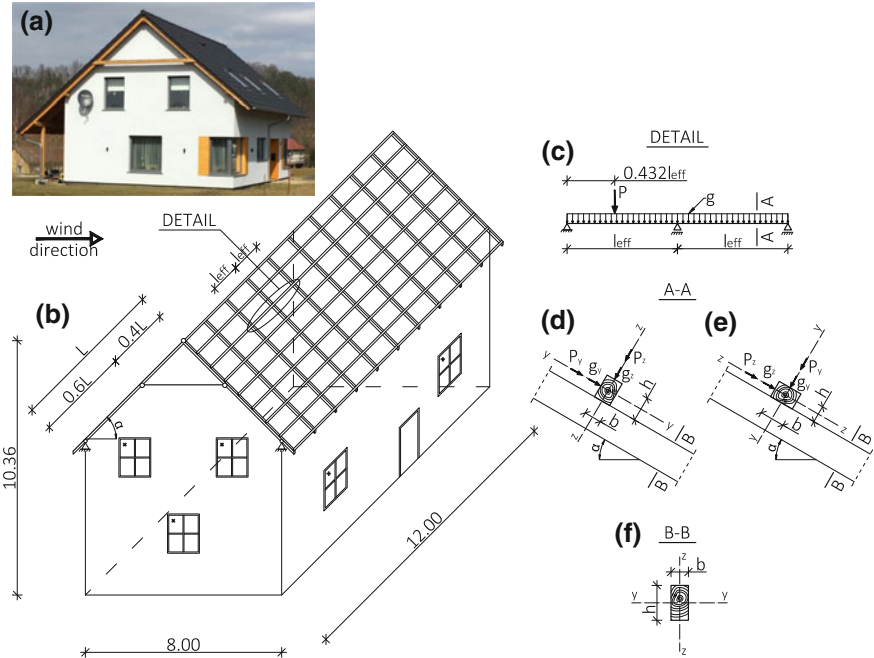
The example of the construction of traditional sloped roofs where the following can be perceived: a rafter spacing, b force from a standing carpenter on a patch, c loads from roof covering, d patch participation in roof construction, e roof covering and patch spacing
